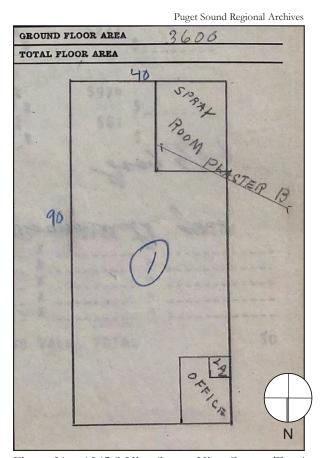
• 1265 S King Street, King County Tax Assessor plan (north is down in this plan)
